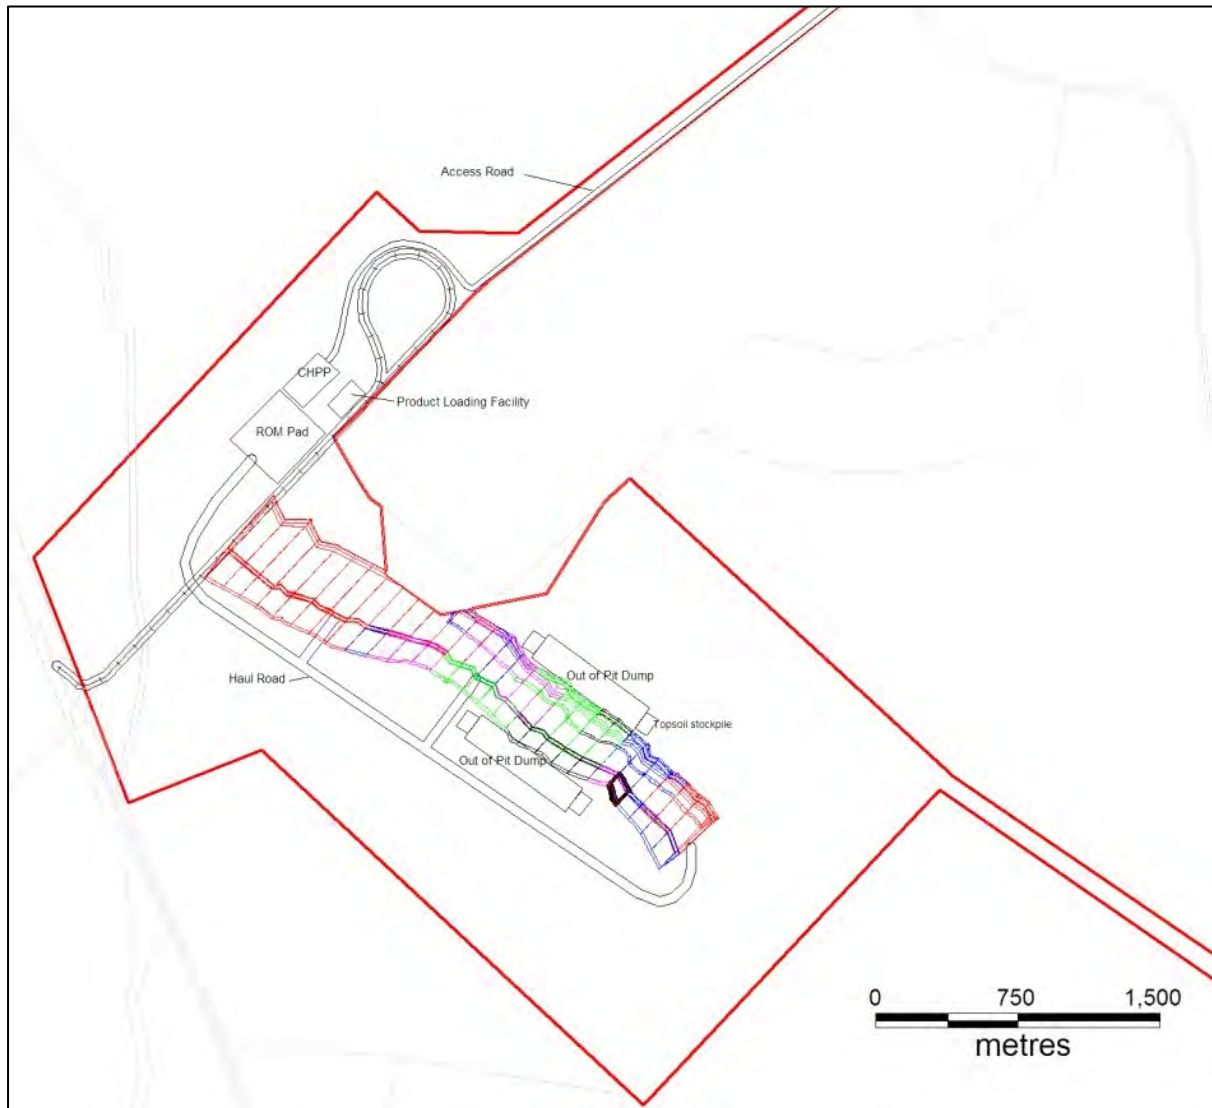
Colton Mine Proposed Mining and Infrastructure Layout
